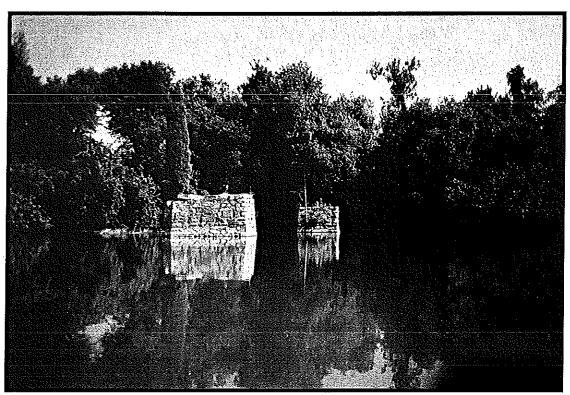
Looking north toward piers of Beard's Bridge/Piedmont Toll Bridge and island.
